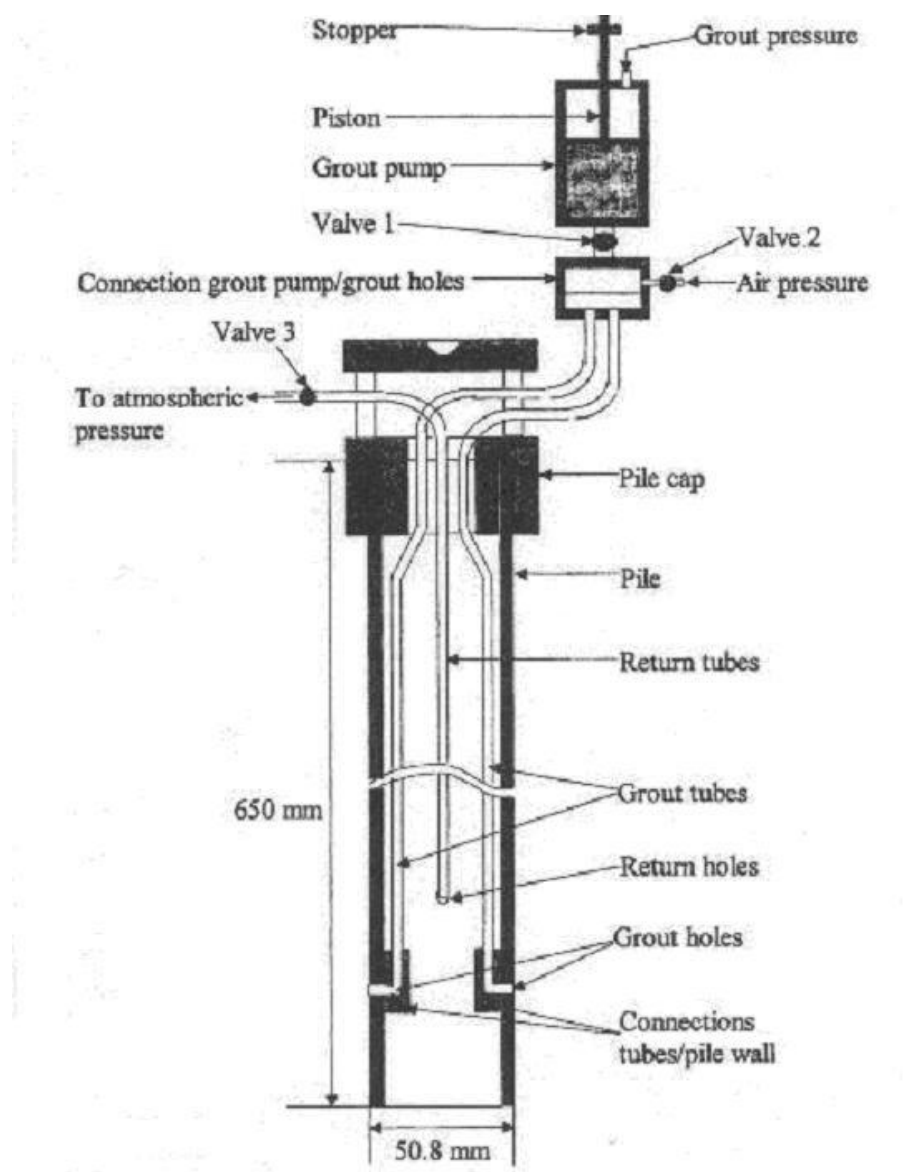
Side grouting system for precast pile (Joer et al. 1998).
